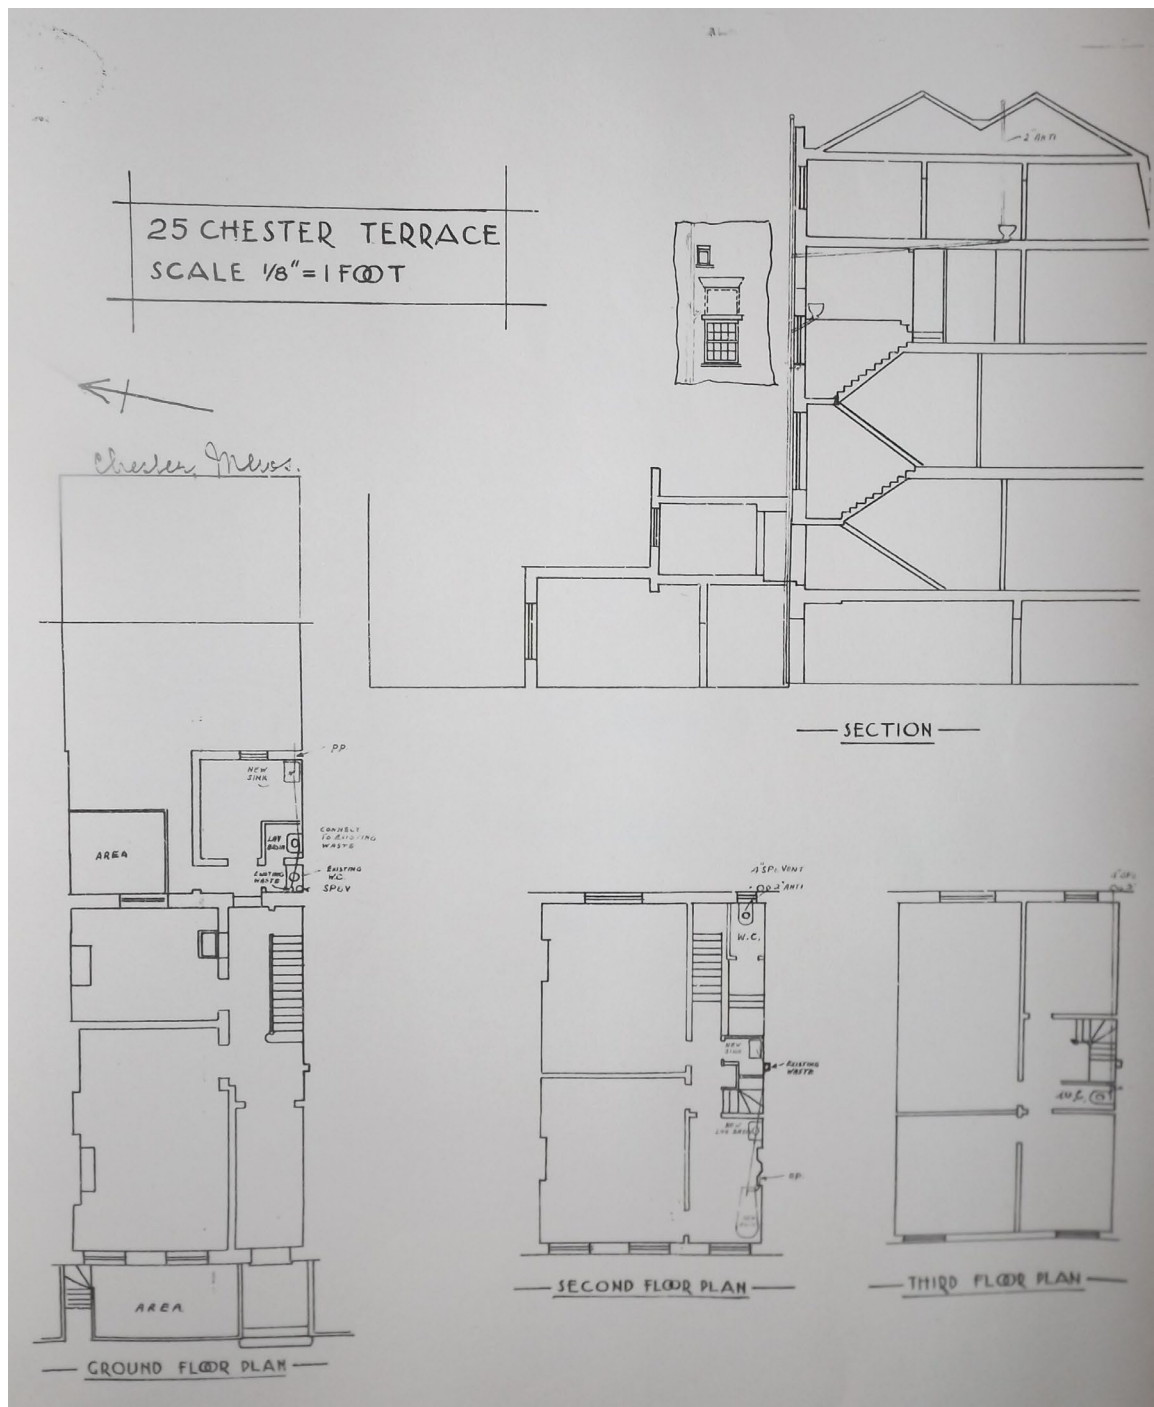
1924 Drainage Plans of the ground, second and third floor and a section
